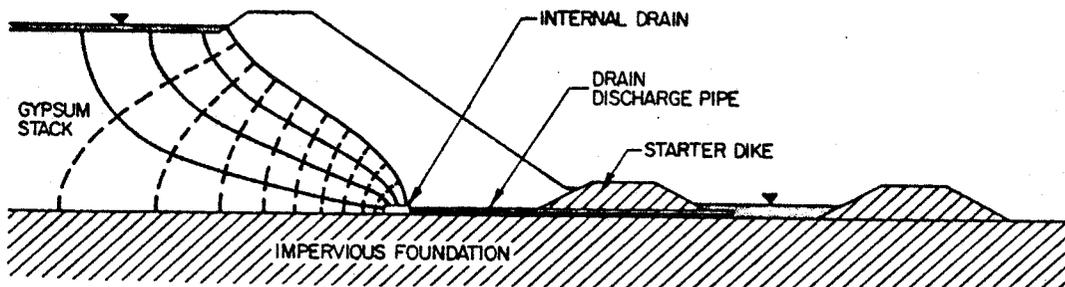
Seepage Pattern through a Gypsum Stack on an Impervious Foundation
